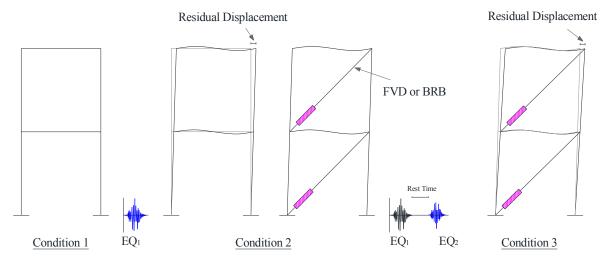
Proposed retrofitting procedure for steel damaged buildings under MA sequences.
